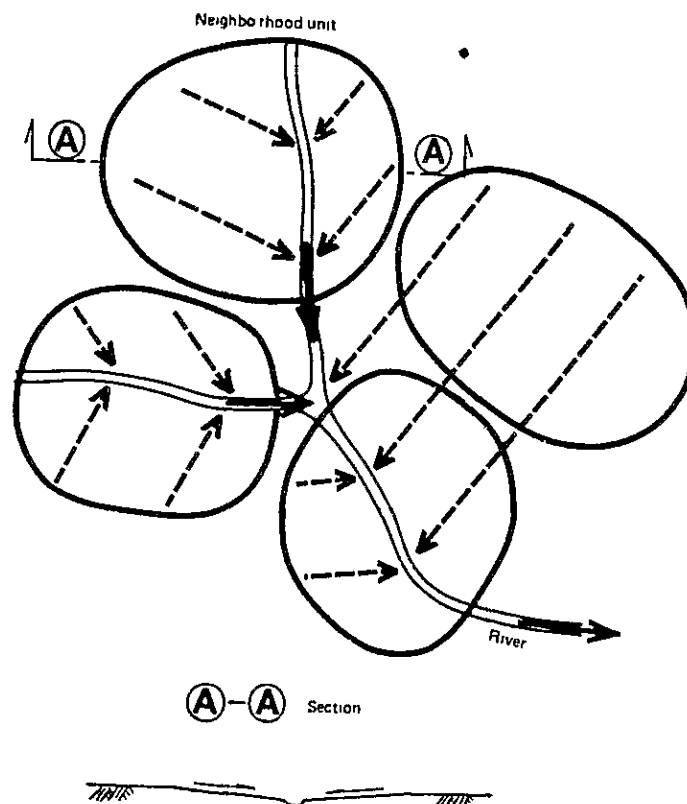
Schematic Plan and Section of Stormwater Collection System
